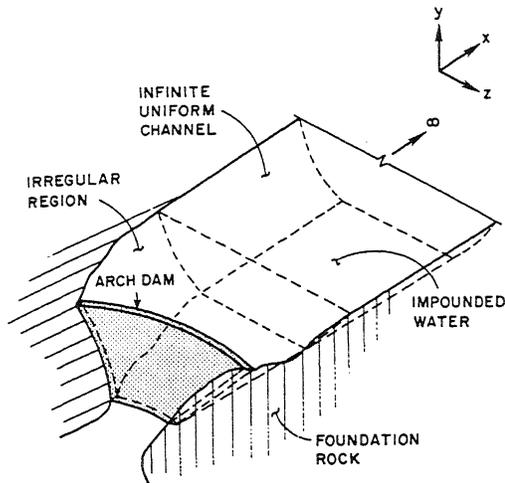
Arch dam-water-foundation rock system (Fok and Chopra 1985).
